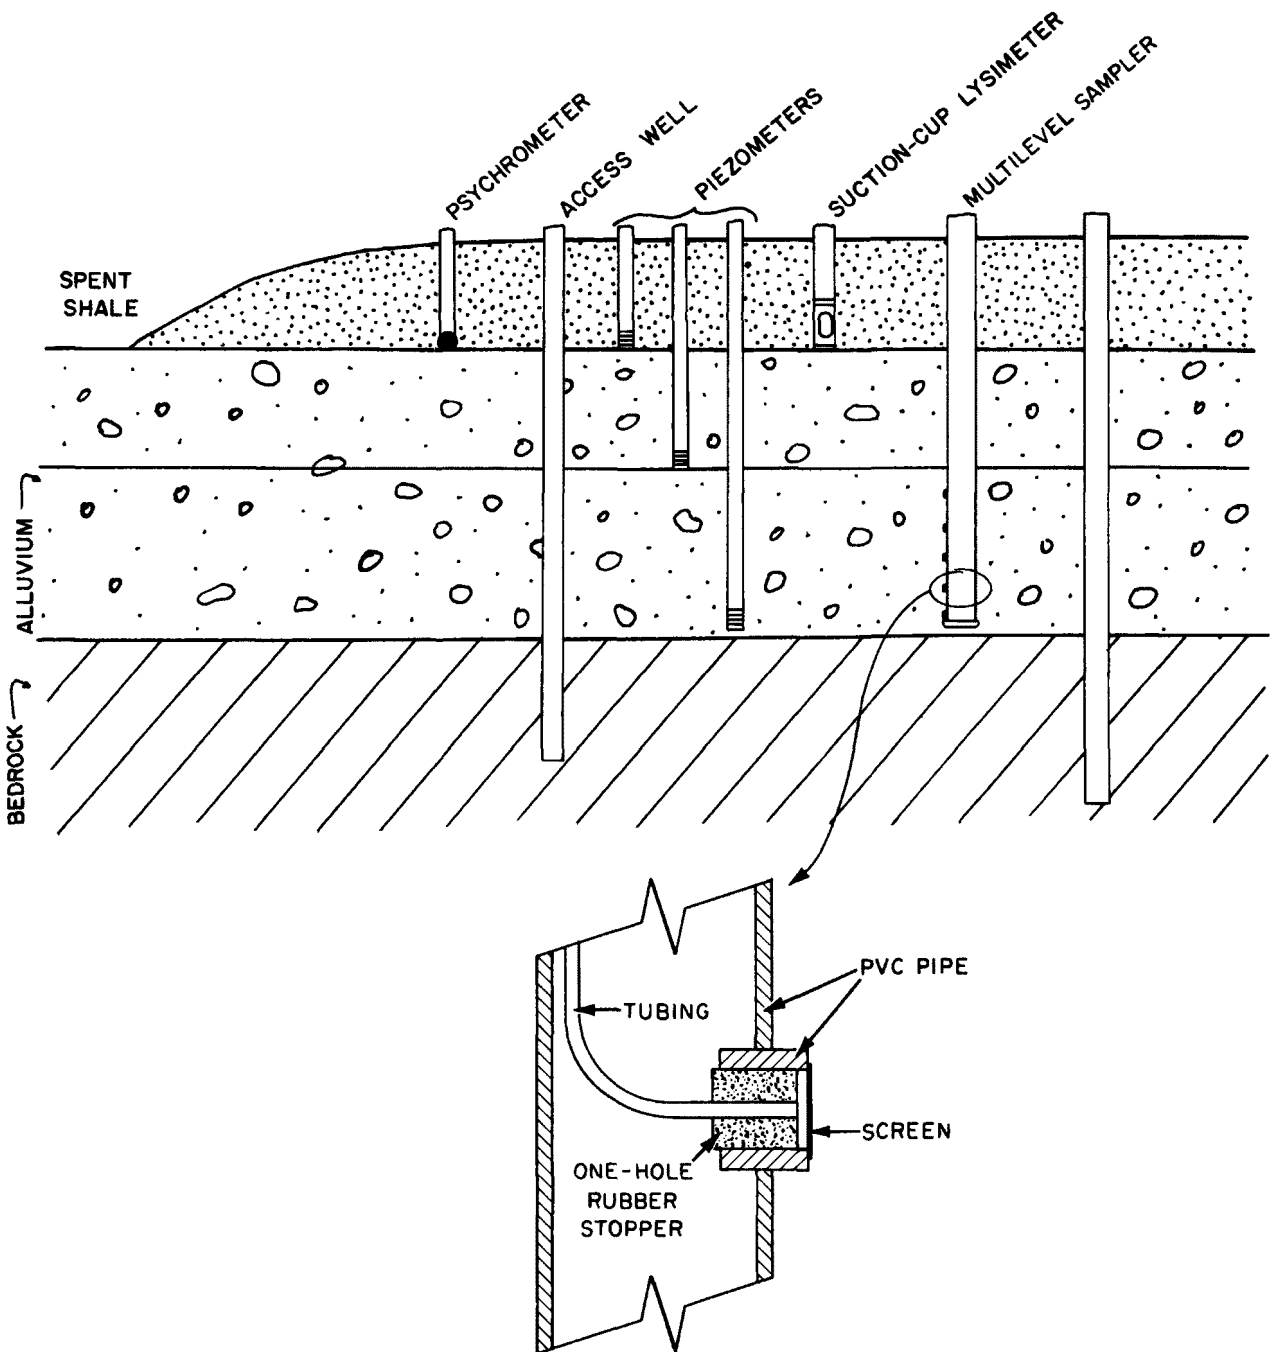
Possible monitoring facilities for spent-shale pile during construction.
